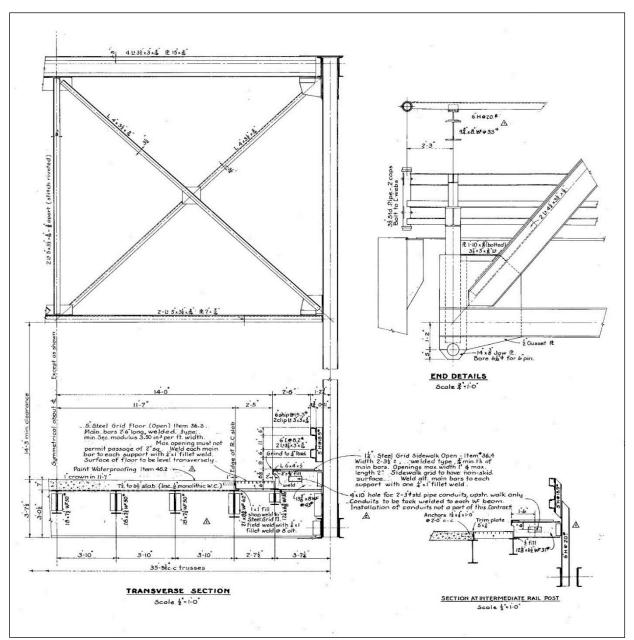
Sections and details. From original NHHD plans (File 2-10-1-1). Sheet 9 of 10, dated March 1946. Source: NHDOT, Original Plans.
